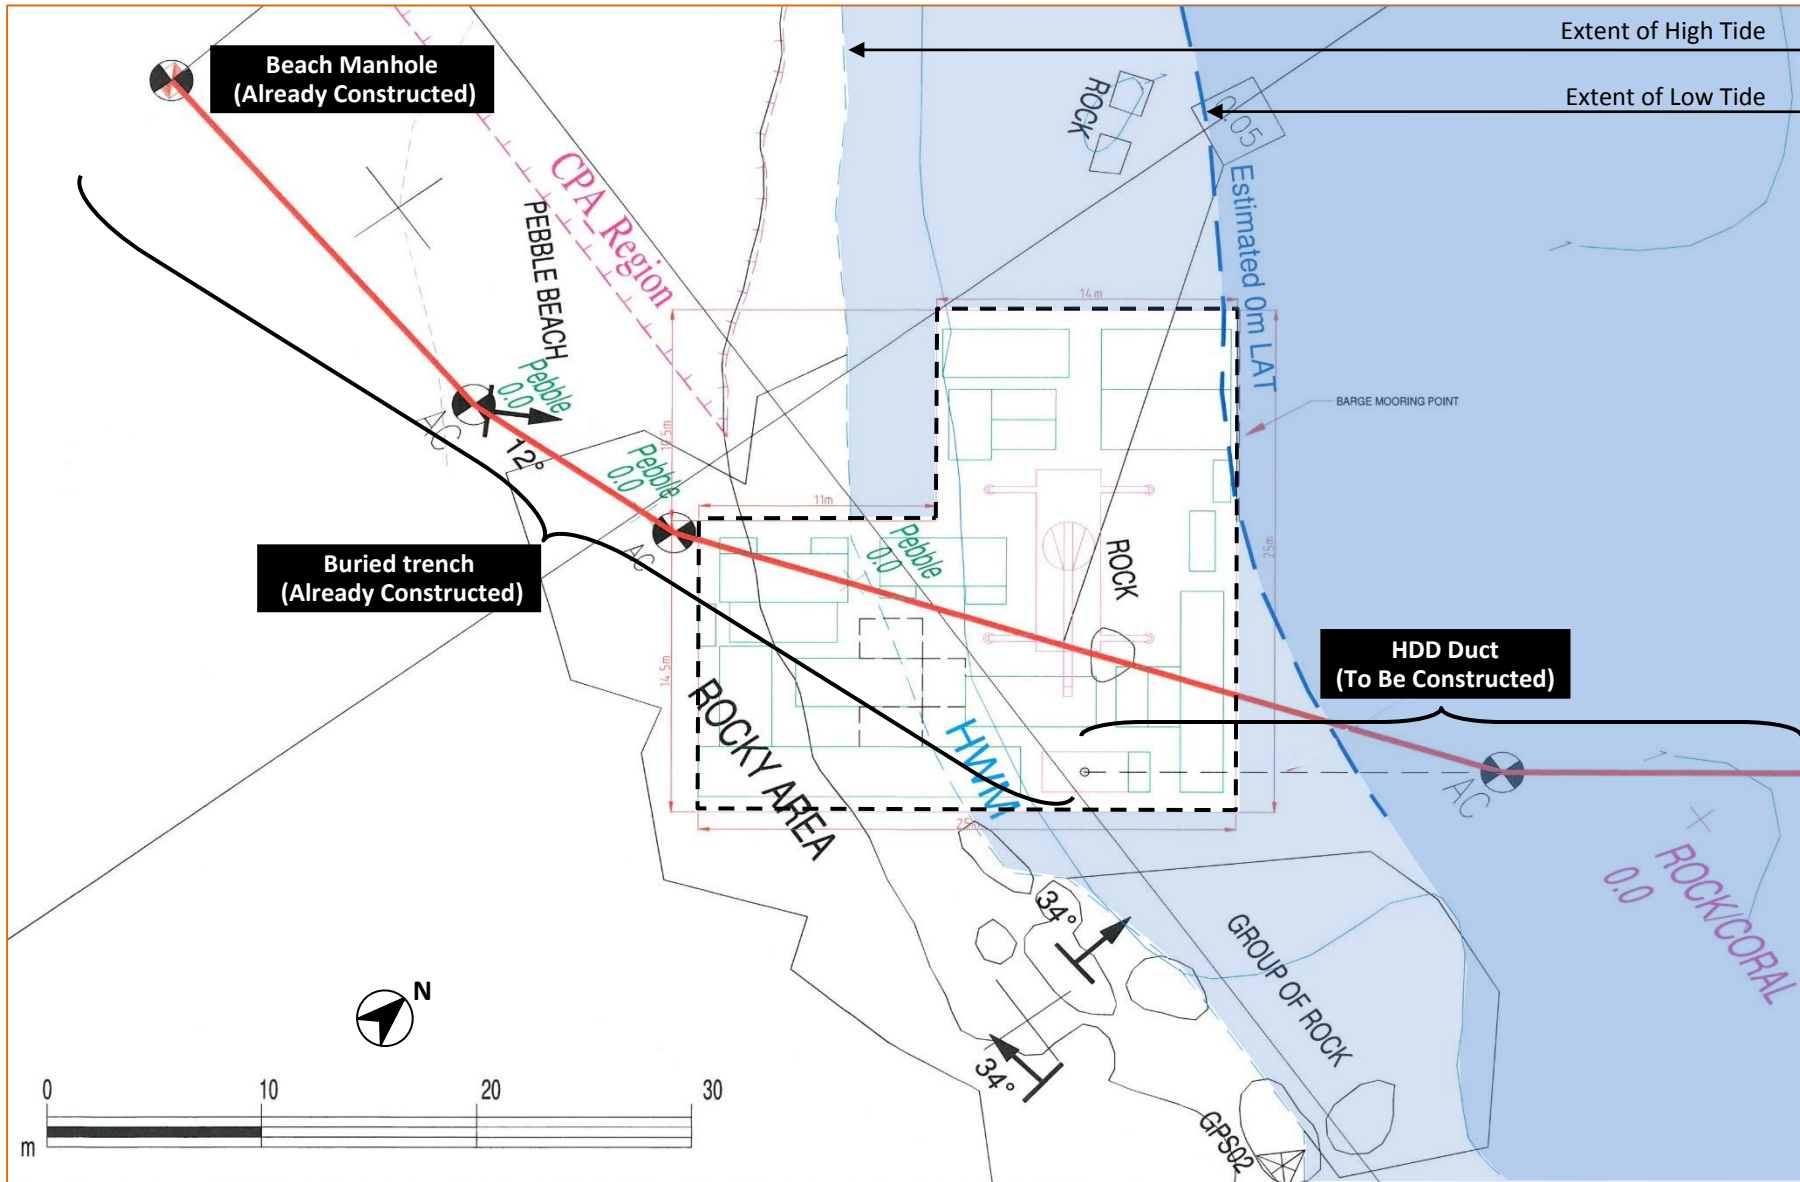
Proposed Arrangement of HDD Plant and Equipment on Temporary Working Platform
